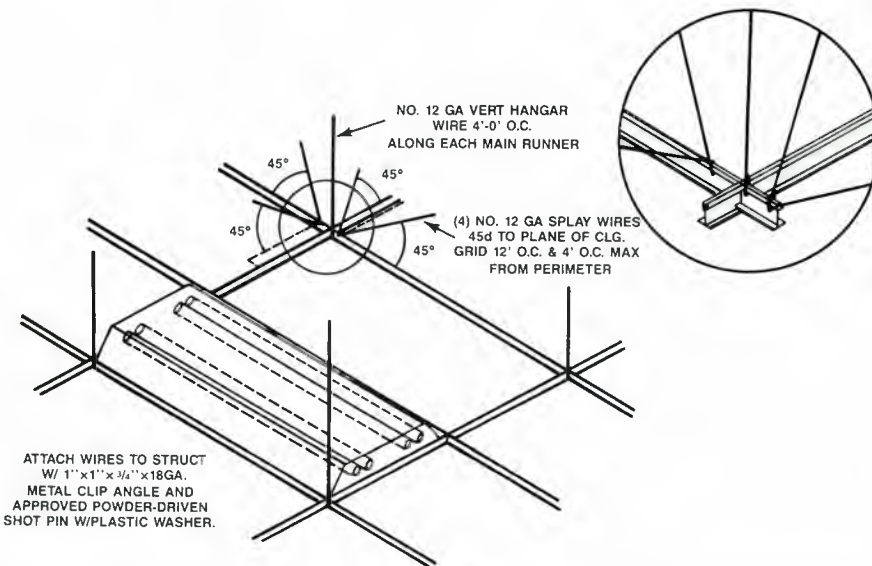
Bracing for ceiling and lighting fixtures will allow the ceiling to withstand greater lateral force.
